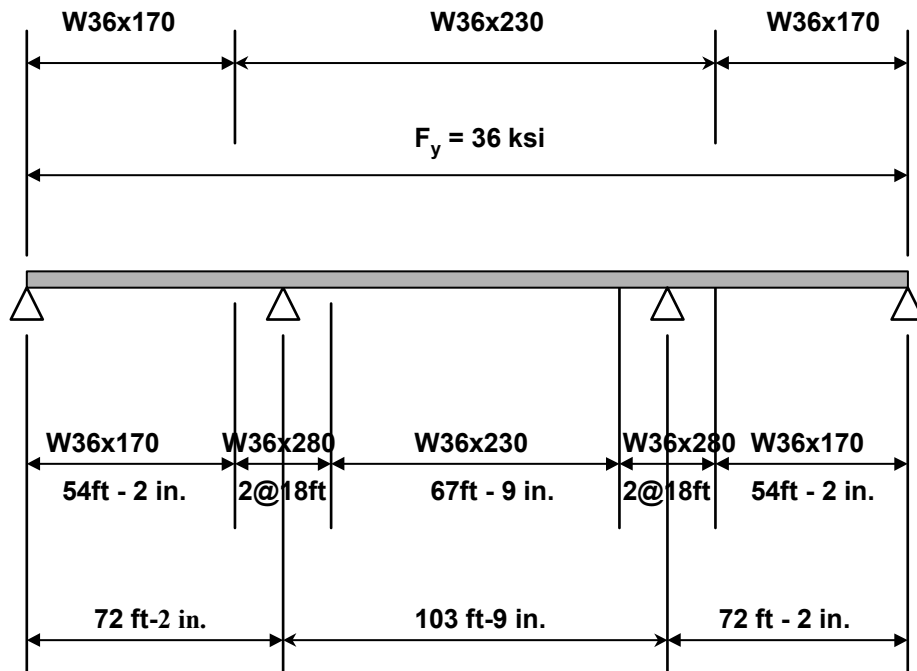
Beam Details for 3-Span Continuous Bridge
